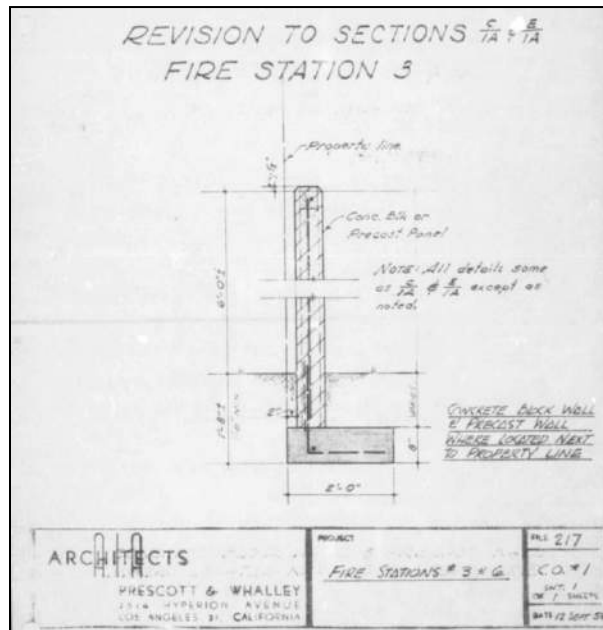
Prescott and Whalley Fire Station # 3 Plan
